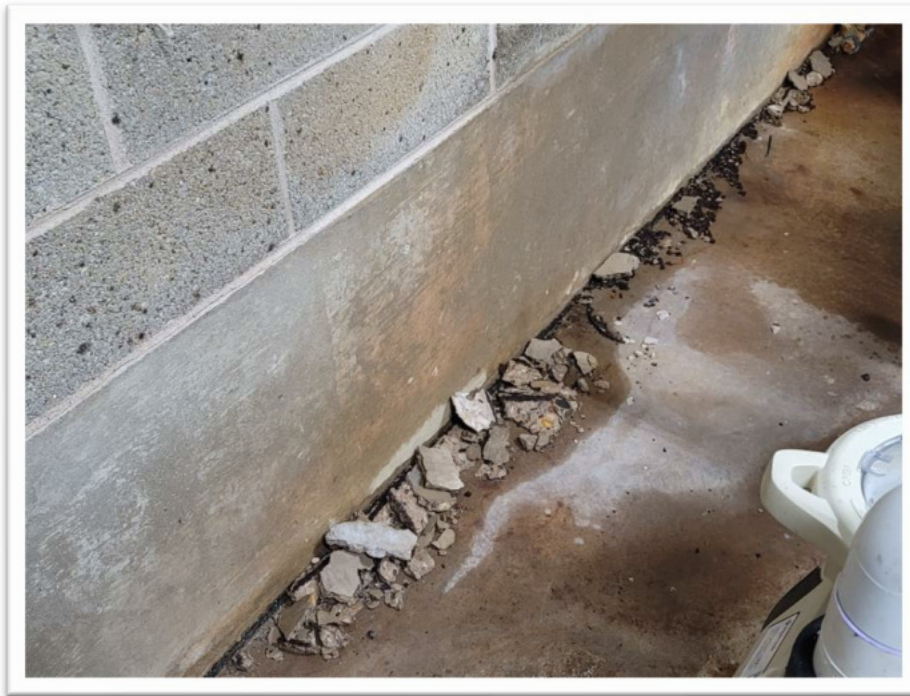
Crumbling concrete pieces from the ceilings.
